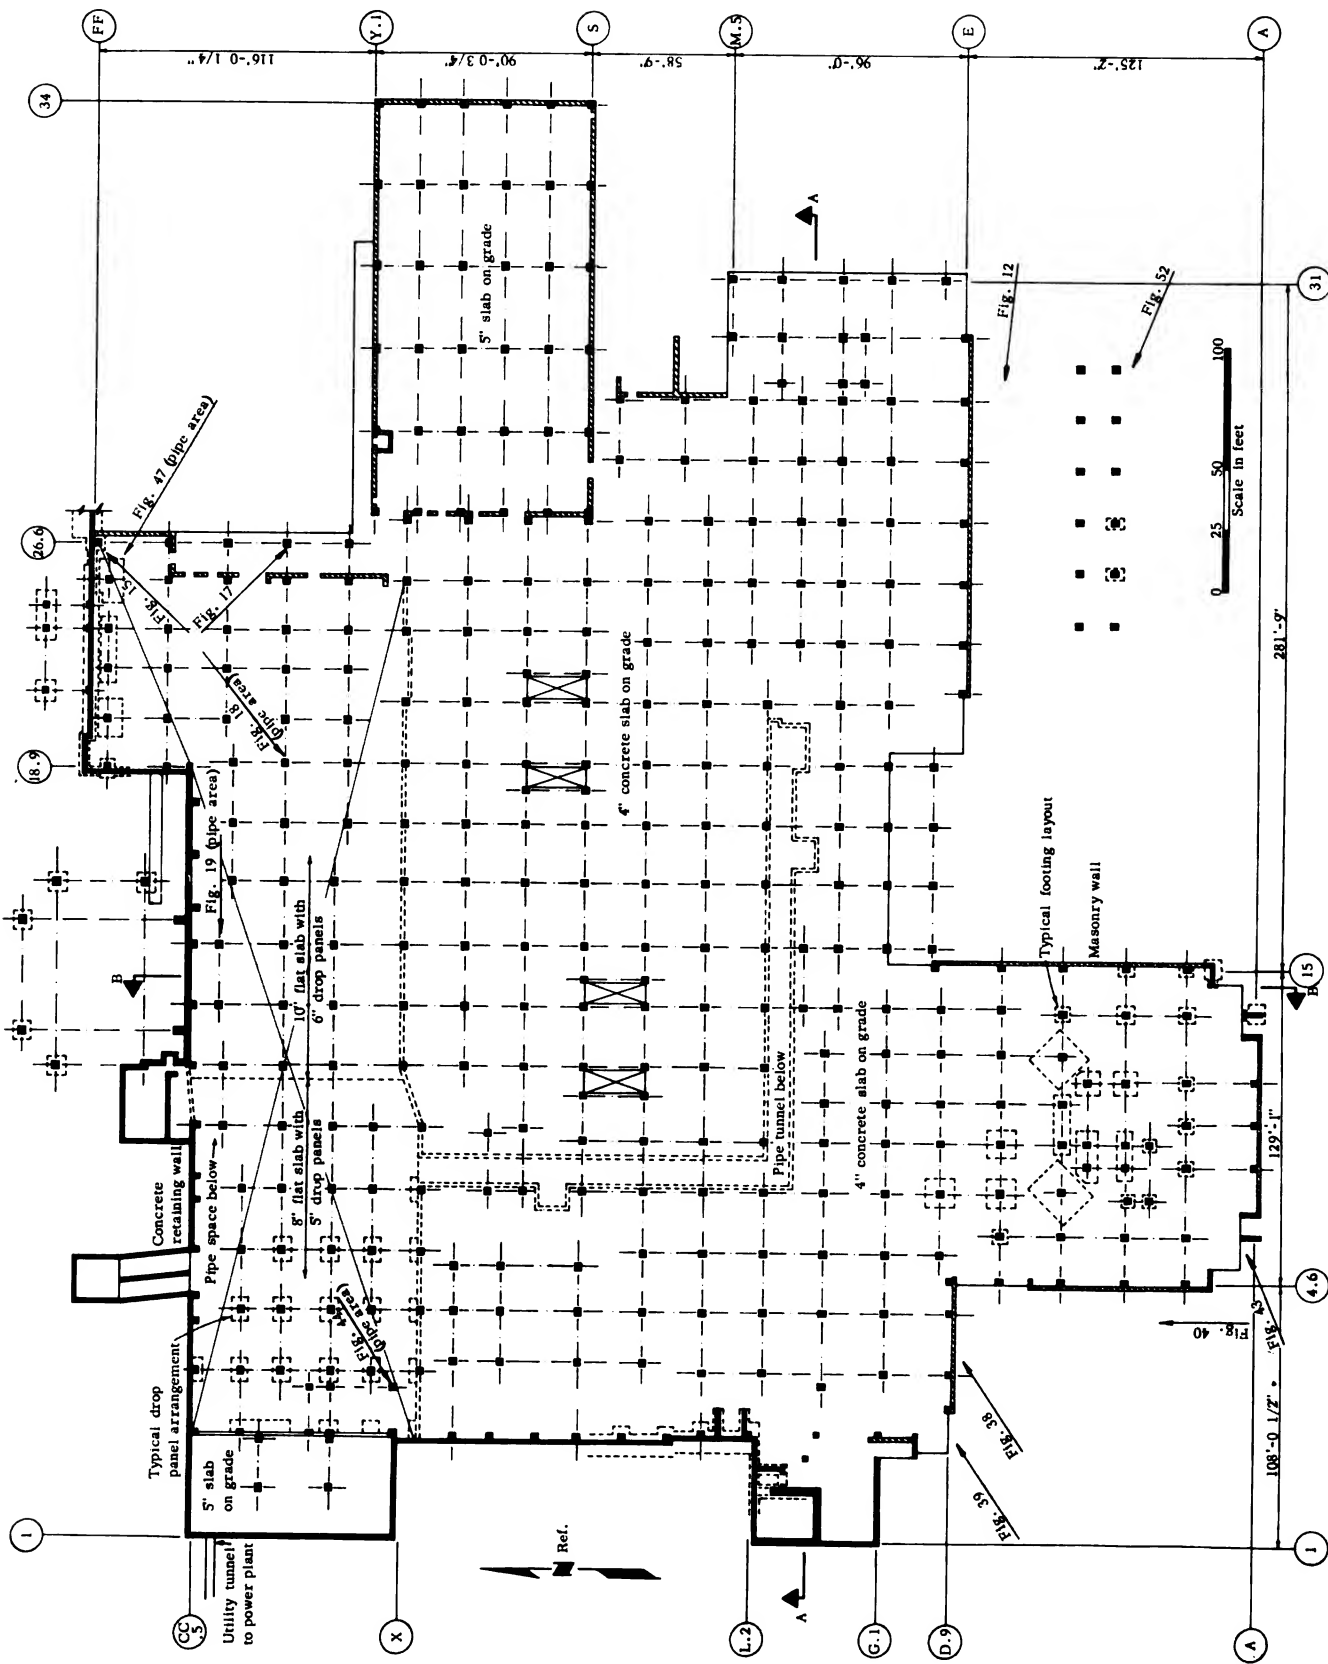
Olive View Hospital, medical treatment and care unit, ground-floor and foundation plan.
